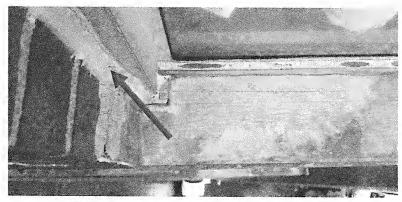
Window perimeter cohesive sealant failure at west facade
